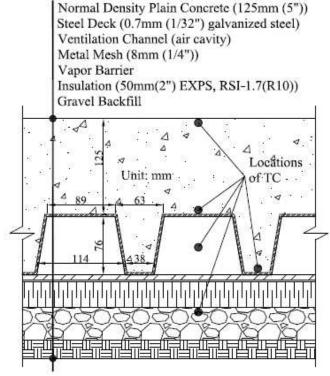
Cross-section of ventilated concrete slab sub-system Image Source: (Chen et al., 2010b)
